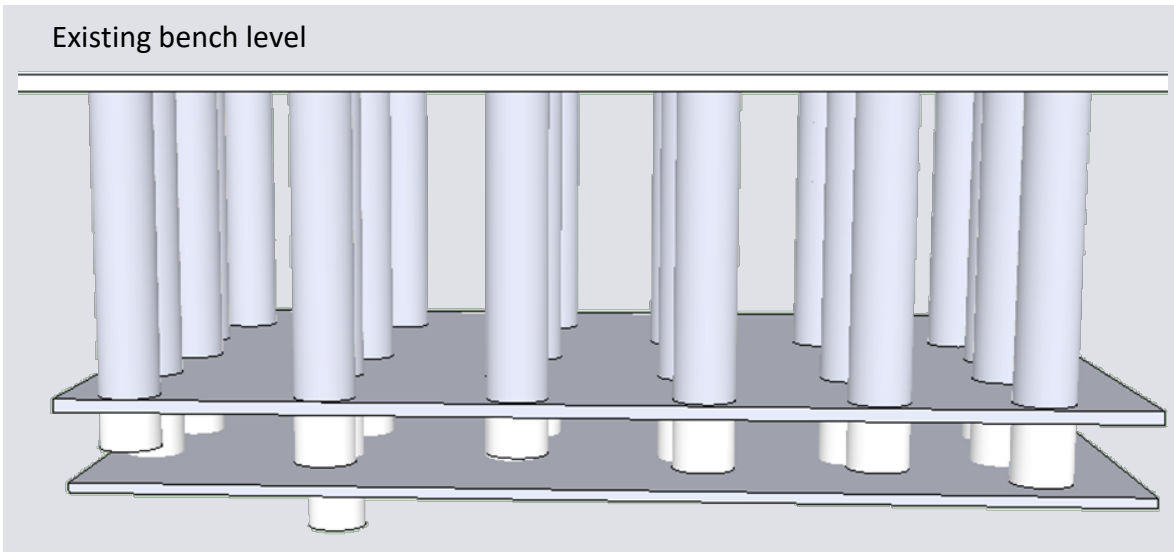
Depiction of a block of ground drilled showing designed versus actual elevations
